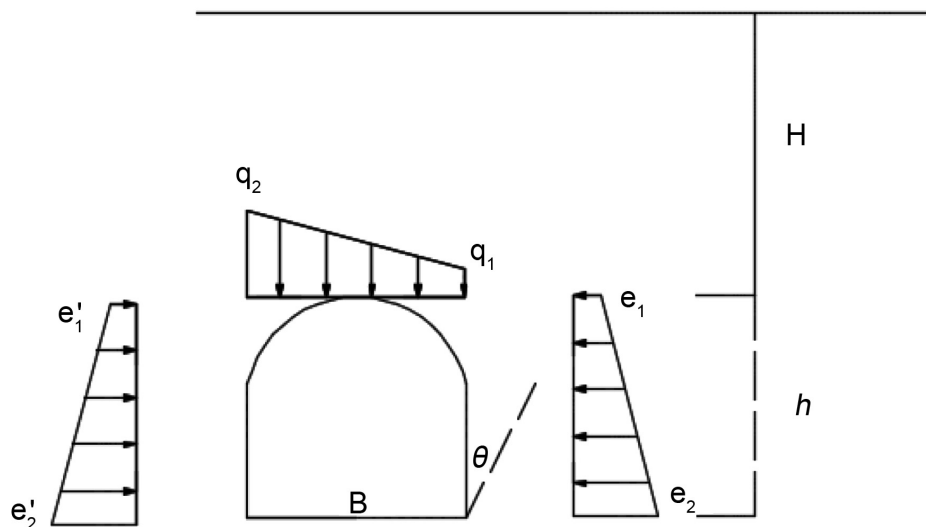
Calculation of surrounding rock pressure calculation of tunnels B1 and B5
